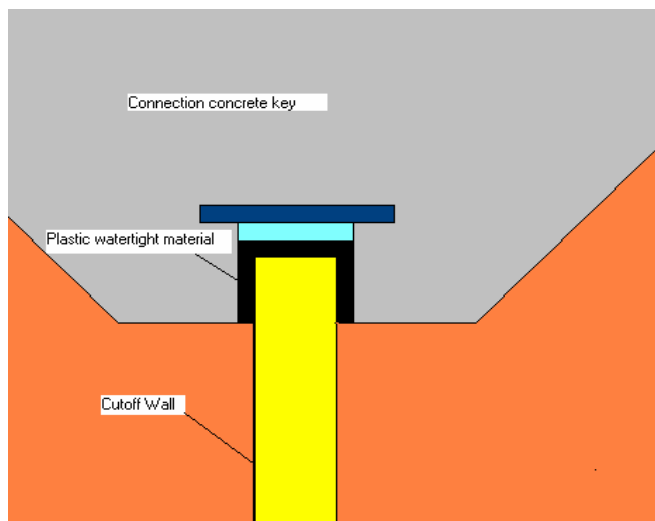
Schematic picture of the connection between the cut-off wall and other dam structures such as diversion culvert, spillway and power tunnels
